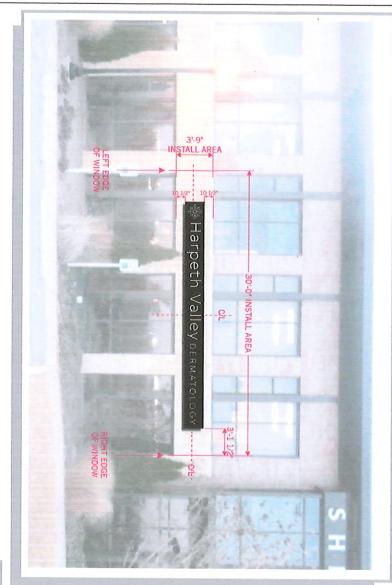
PHOTO RENDERING PAGE 2 SIGN DETAILS PAGE 3
